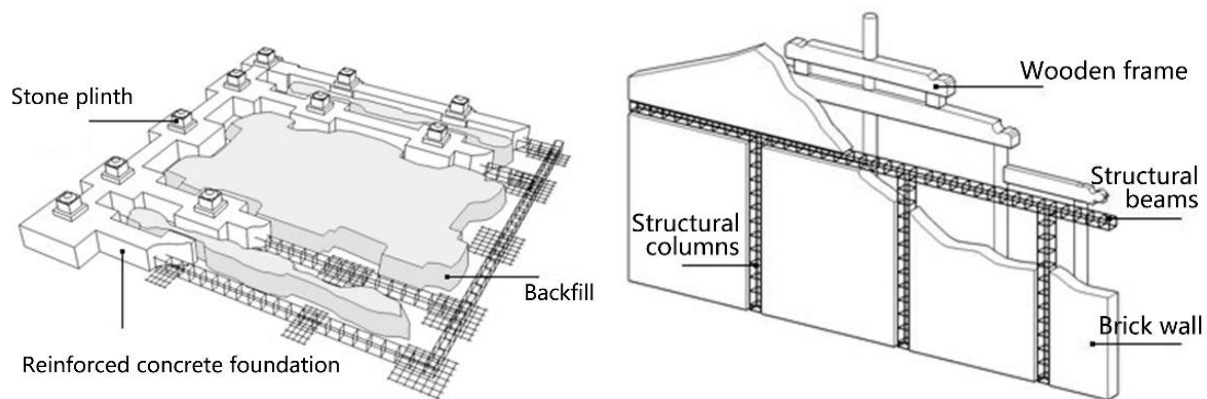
Foundation reinforcement (self-painted) Fig. 5 Wall reinforcement (self-painted)
